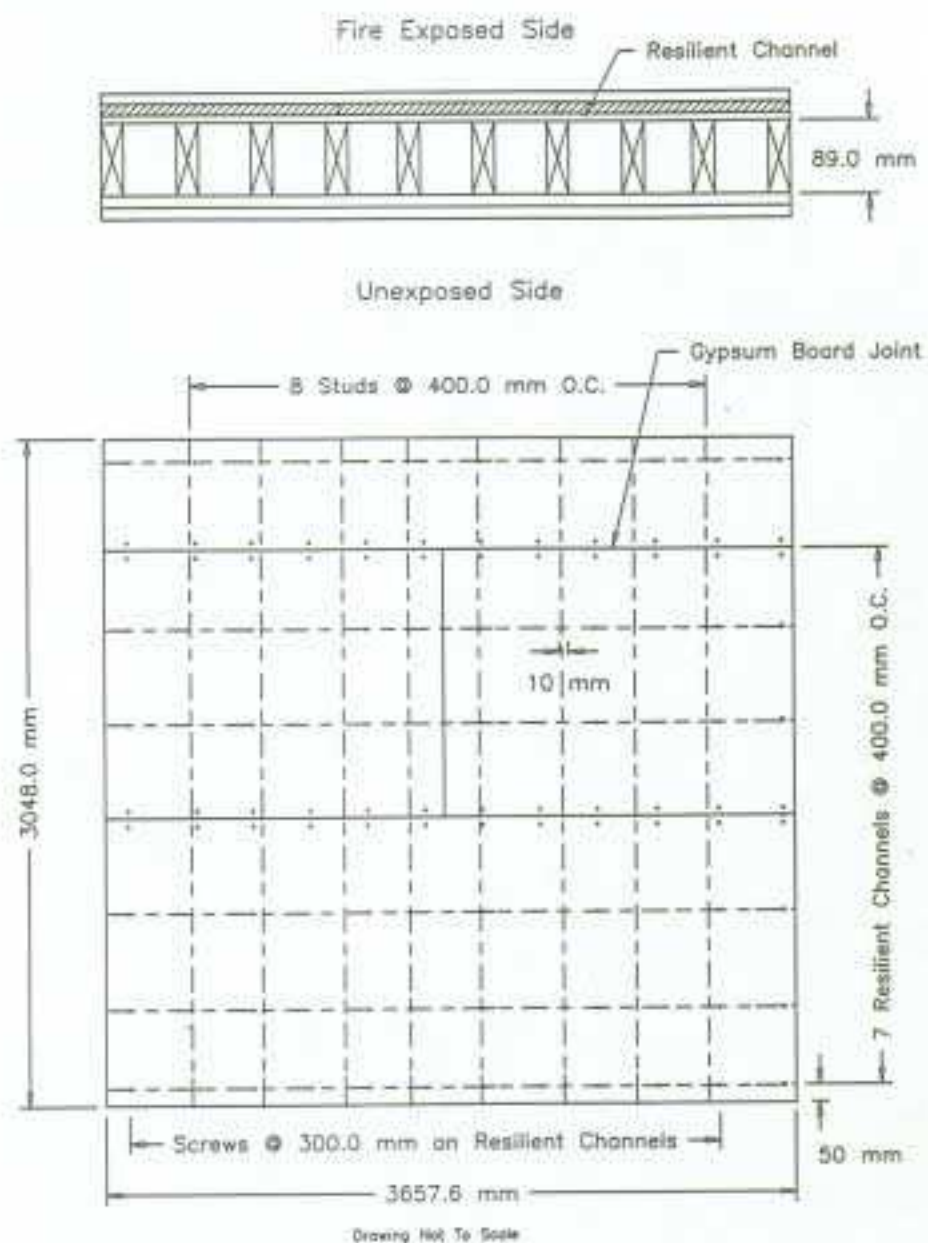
Screw Locations For Wood Stud, 2x2 Gypsum Board Layers, Full-Scale Assembly, Resilient Channel on Exposed Side (Base Layer Exposed Side)
